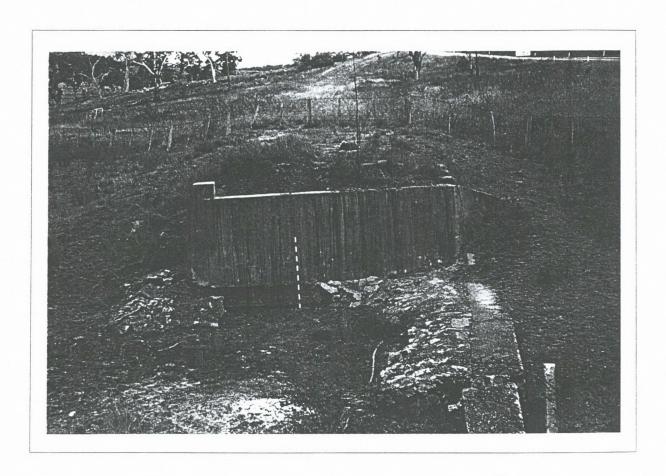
Old Dunduckety Creek Bridge – remains of south eastern abutment
